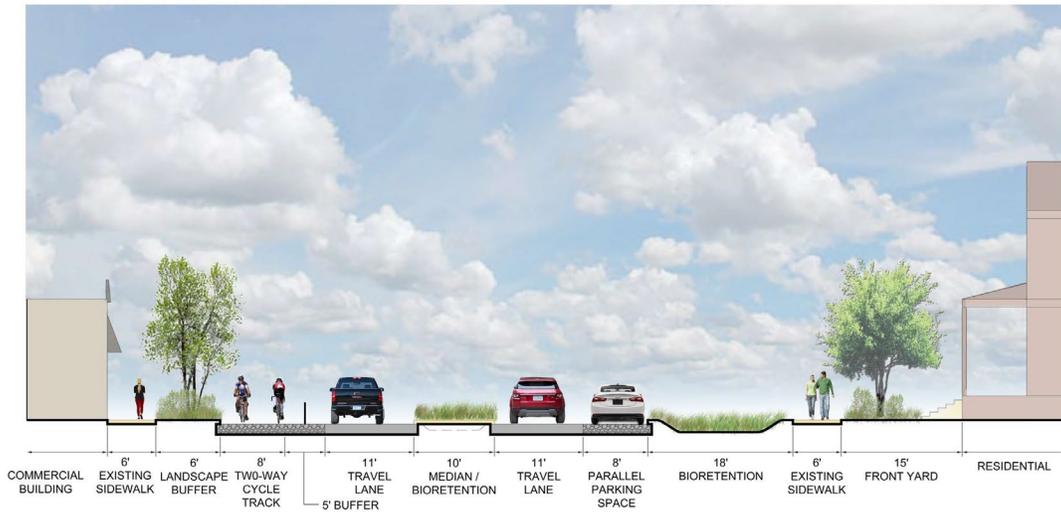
3rd Avenue Complete Street (16th Street to 13th Street)
